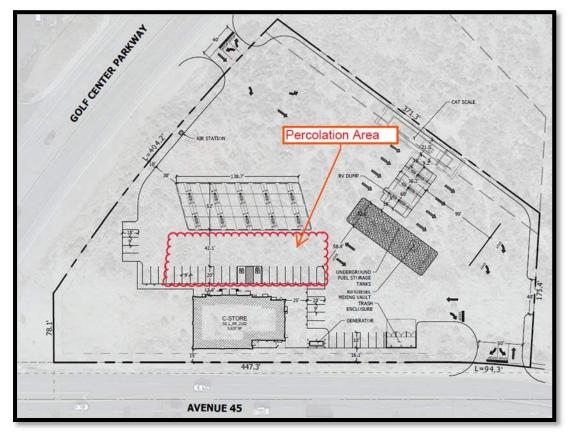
Preliminary Site Plan Showing Assumed Percolation Area
